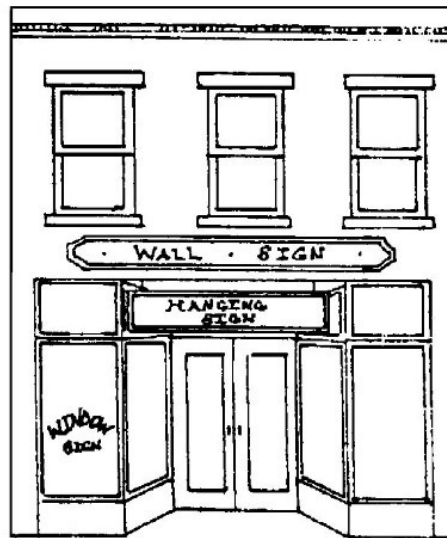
A flat wall sign mounted on the surface of the building. See guideline 8.1.3.a.2.a.
